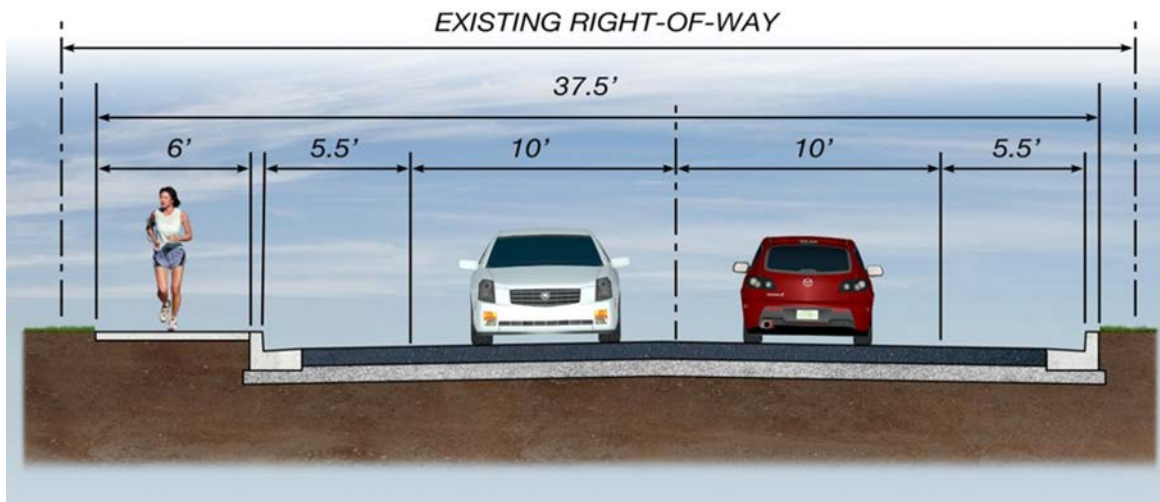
Proposed Roadway Section West of Proposed Movable Bridge
